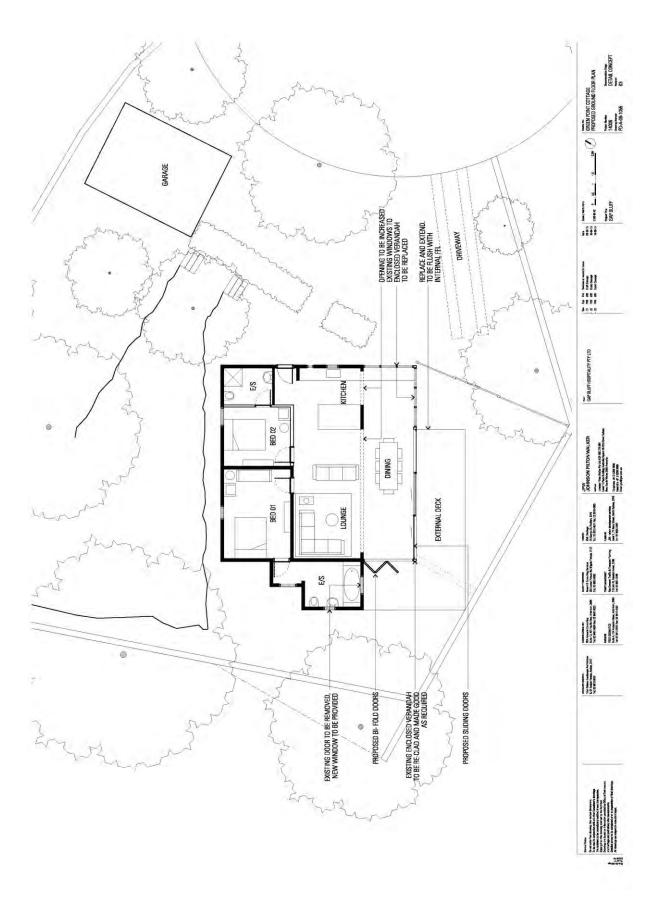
Proposed new floor plan for Green Point Cottage. (Source: JPW 2015)
